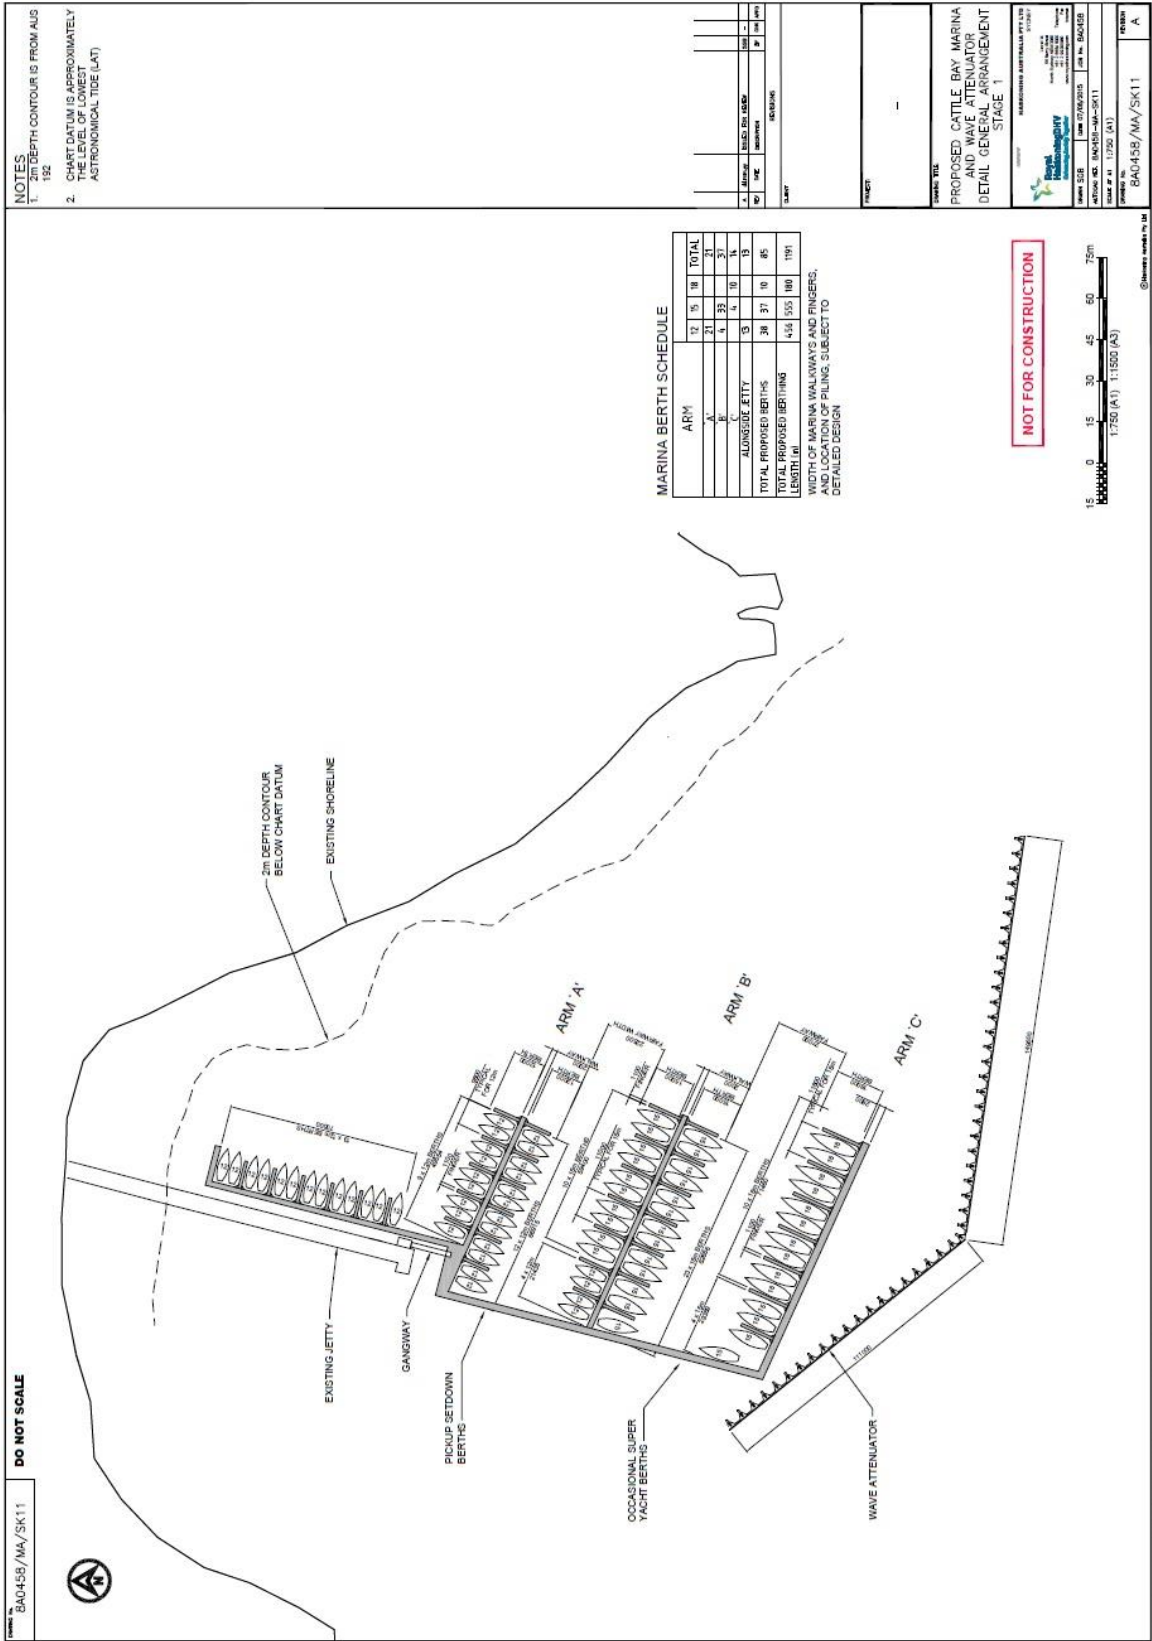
Proposed marina development plan (Stage 1 - water based component)
